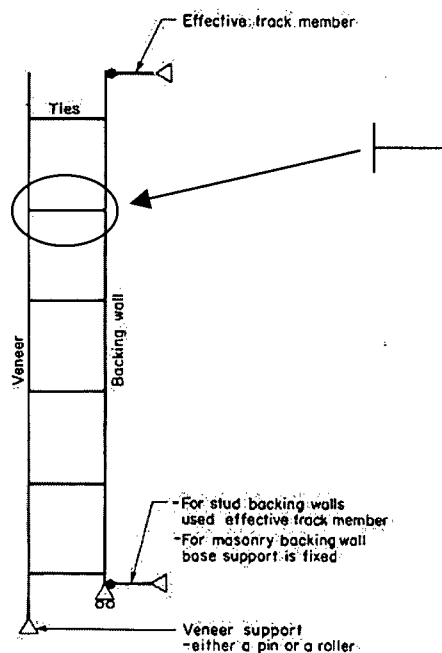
Analytical model of brick veneer connected to a structural backup. (from Ref. 27)
